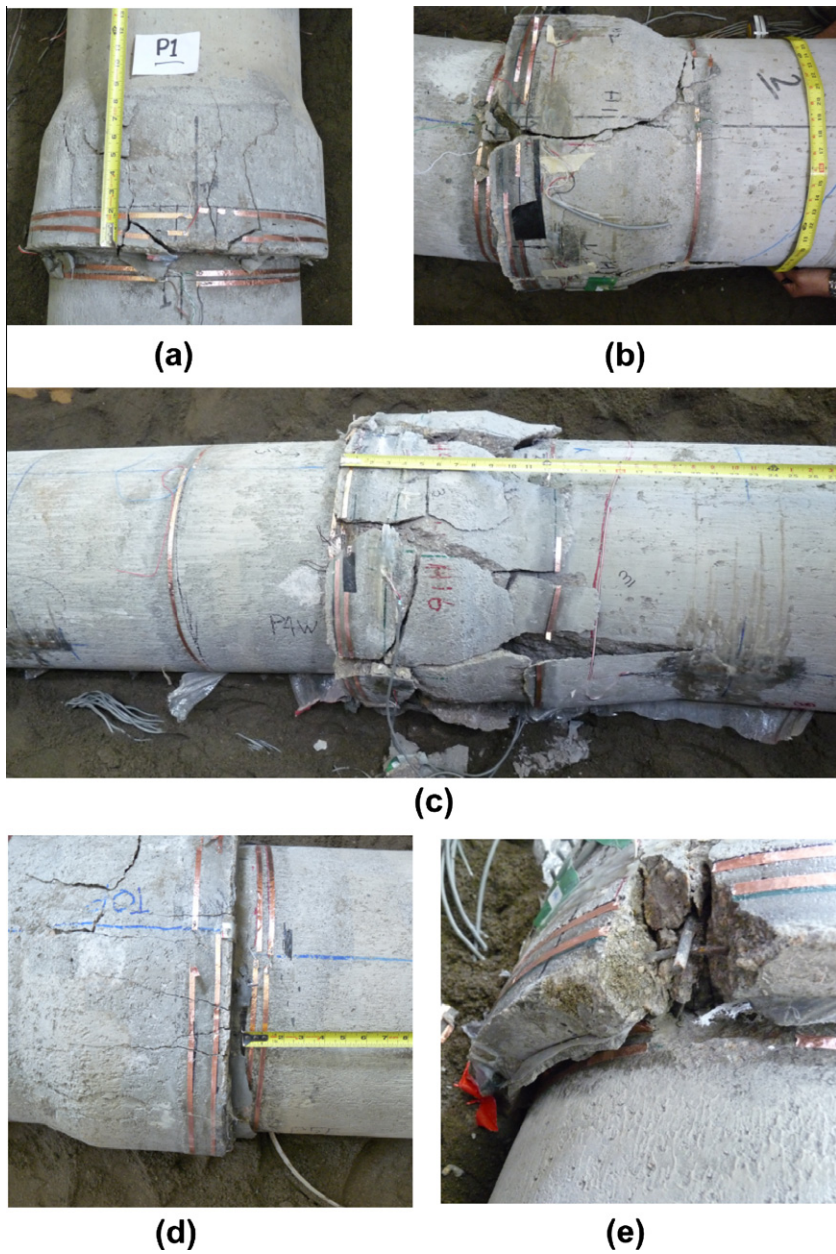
Damage to joints observed after excavation (a) Joint 1, (b) Joint 2, (c) Joint 3, (d) Joint 4, and wedge-breaking type of damage seen in Joint 2.
